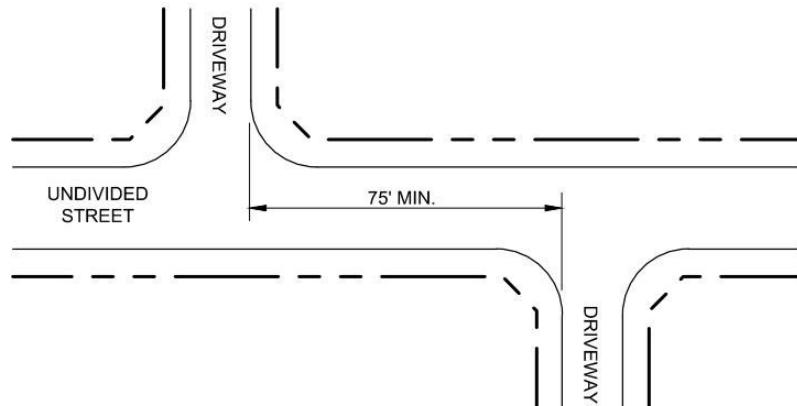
Driveway Spacing on Opposite Sides of an Undivided Street
